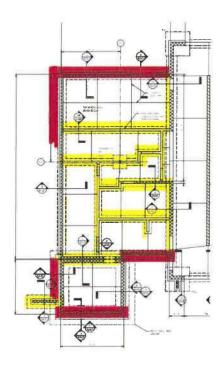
Yellow indicates footings that did not require undercut. Orange indicates footings that required undercut and backfilling with lean concrete.
